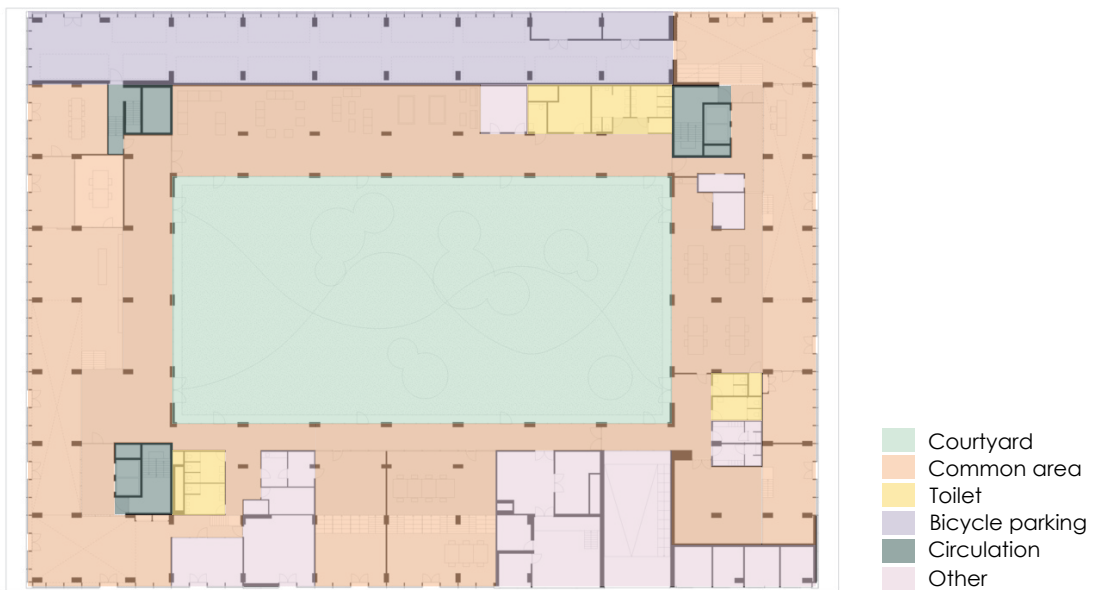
Ground floor plan (Adapted from VURB Architects by author)
